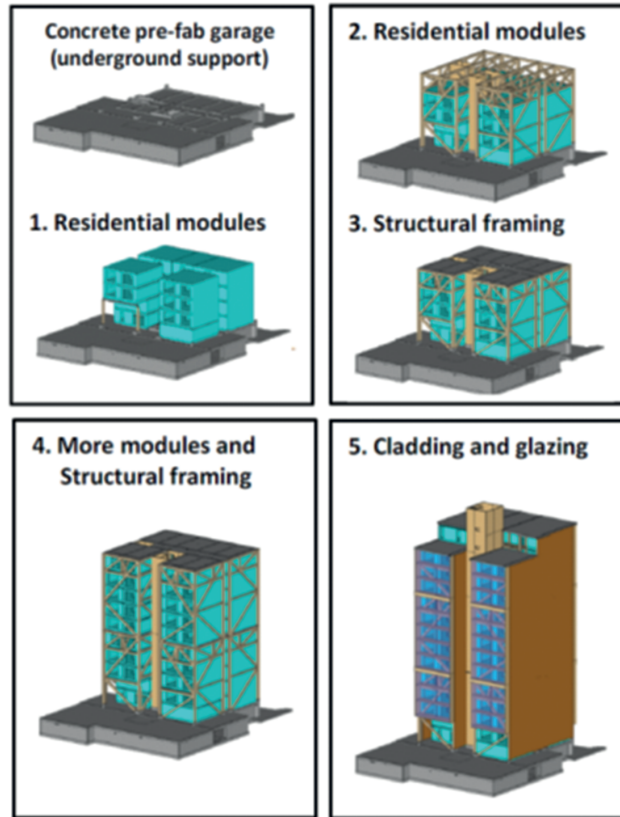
Schematic visualization of the sequential (step-by-step) assembly of the “Treet” building (adopted from [12])
